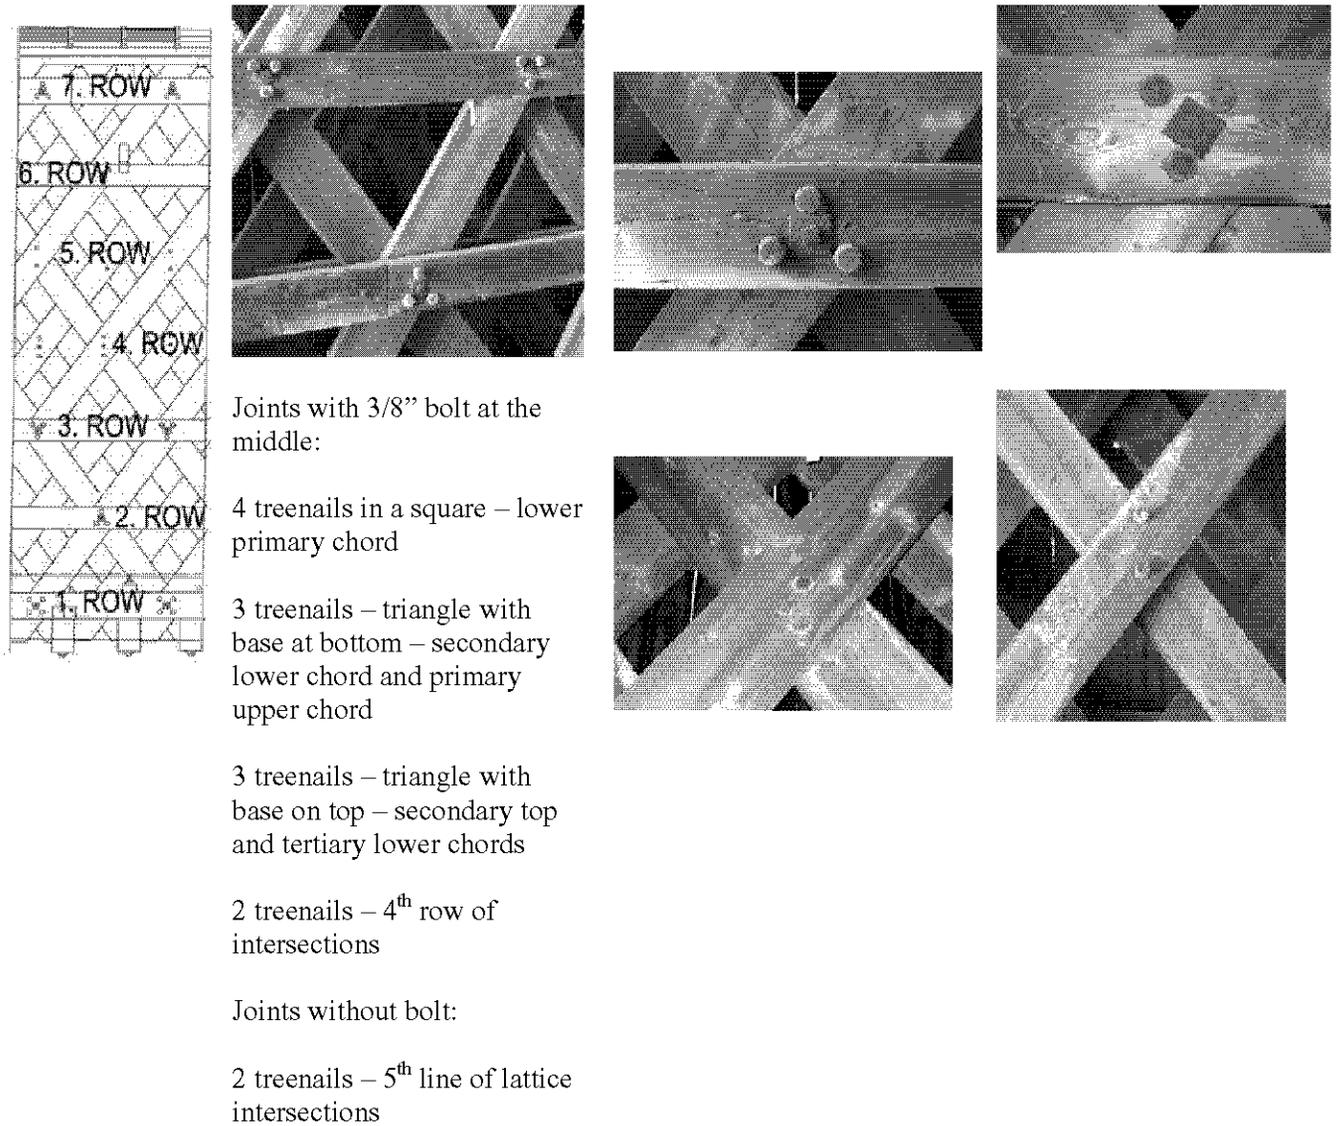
Different treenail-joint patterns used in the Contoocook Railroad Bridge
